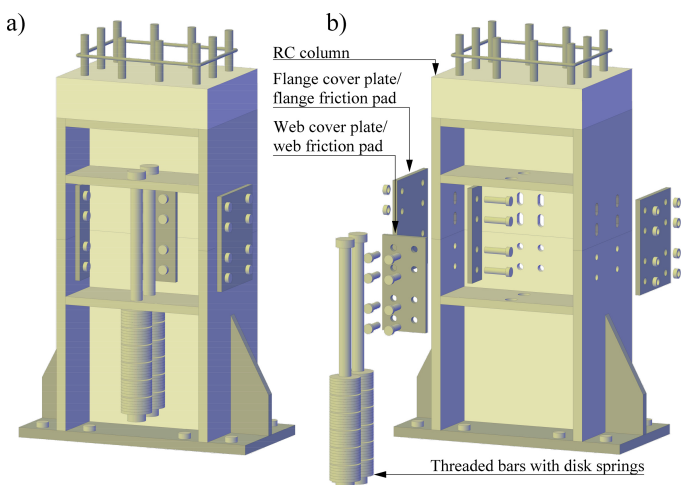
Self-centering connections at RC column base (a), exploded 3D view (b) / Connessione ricentrante alla base del pilastro (a), esplosione di vista 3D (b).
